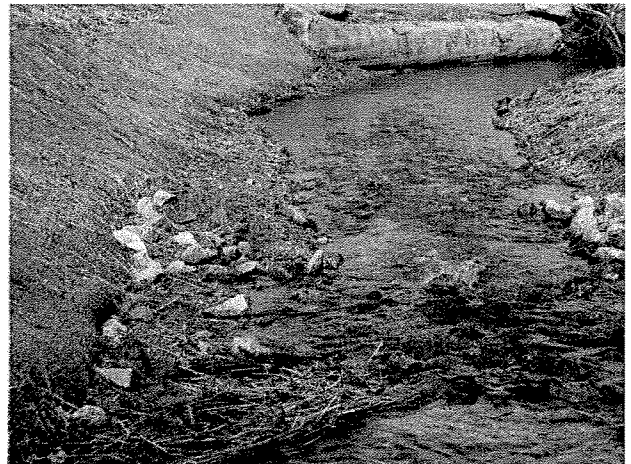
Looking downstream from culvert at log vane, root wads, and log toe protection installed between MC Stations 13+66 and 15+85. (4/7/04)
